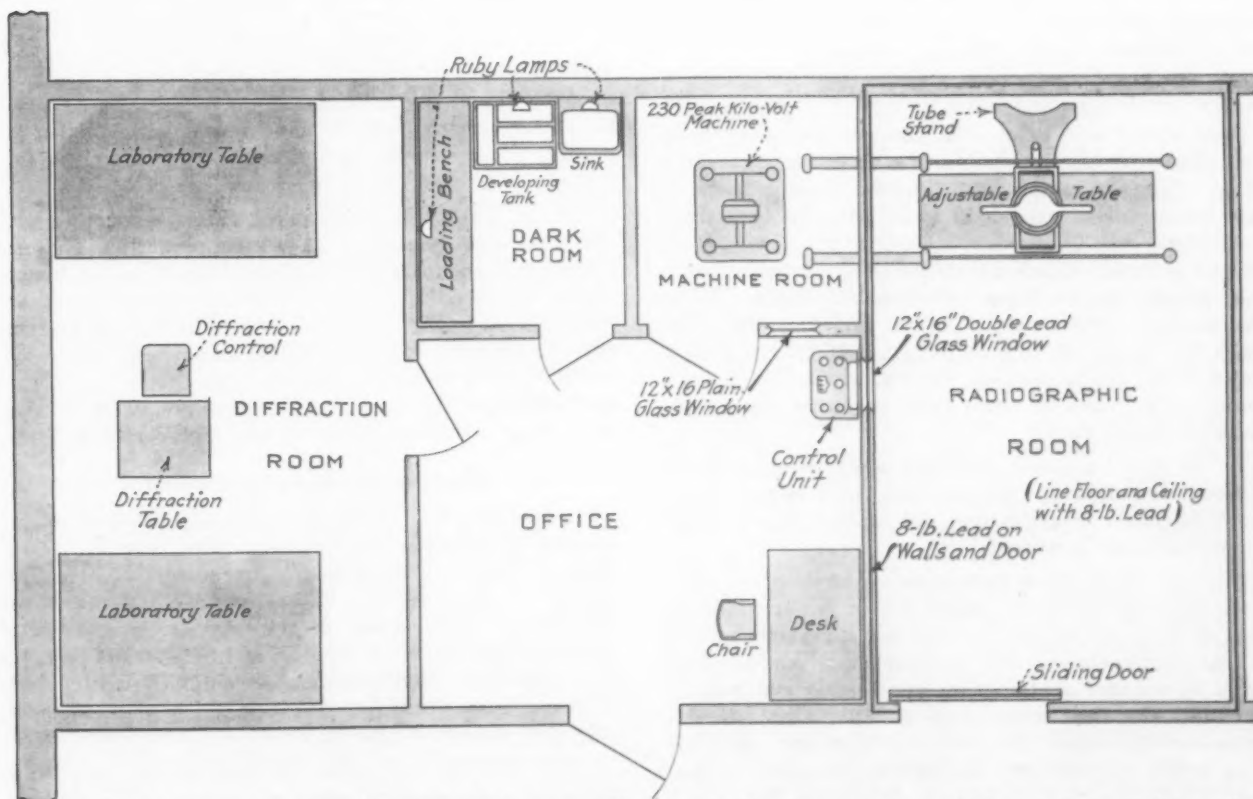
Typical Layout For Complete X-Ray Laboratory. Mobile control units are shown which may be moved into the office enabling the operator to control both machines from his desk. Naturally, the size and arrangement of every laboratory varies to suit the individual requirement
